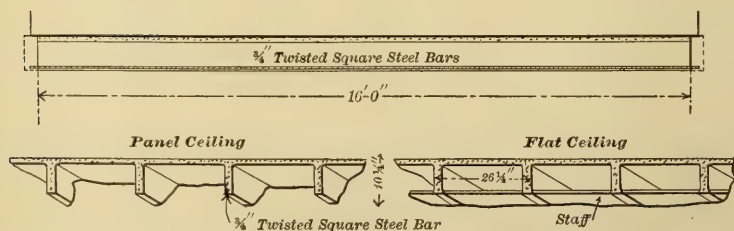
DESIGN FOR FIRE-PROOF FLOORS, RANSOME SYSTEM.
